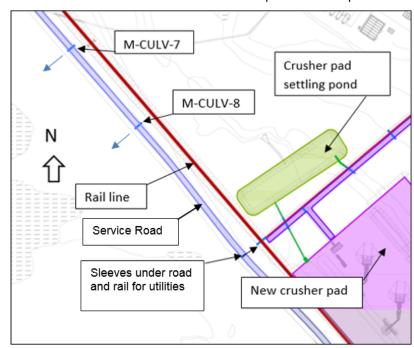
Rail Service & Access Road - Cross Drainage Culverts
